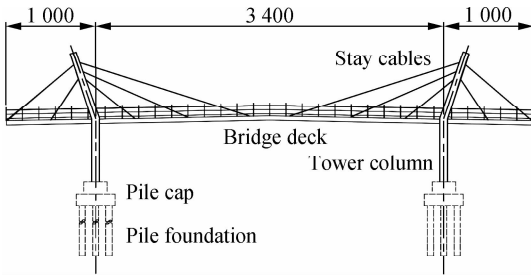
General layout of the pedestrian footbridge (unit: cm)
